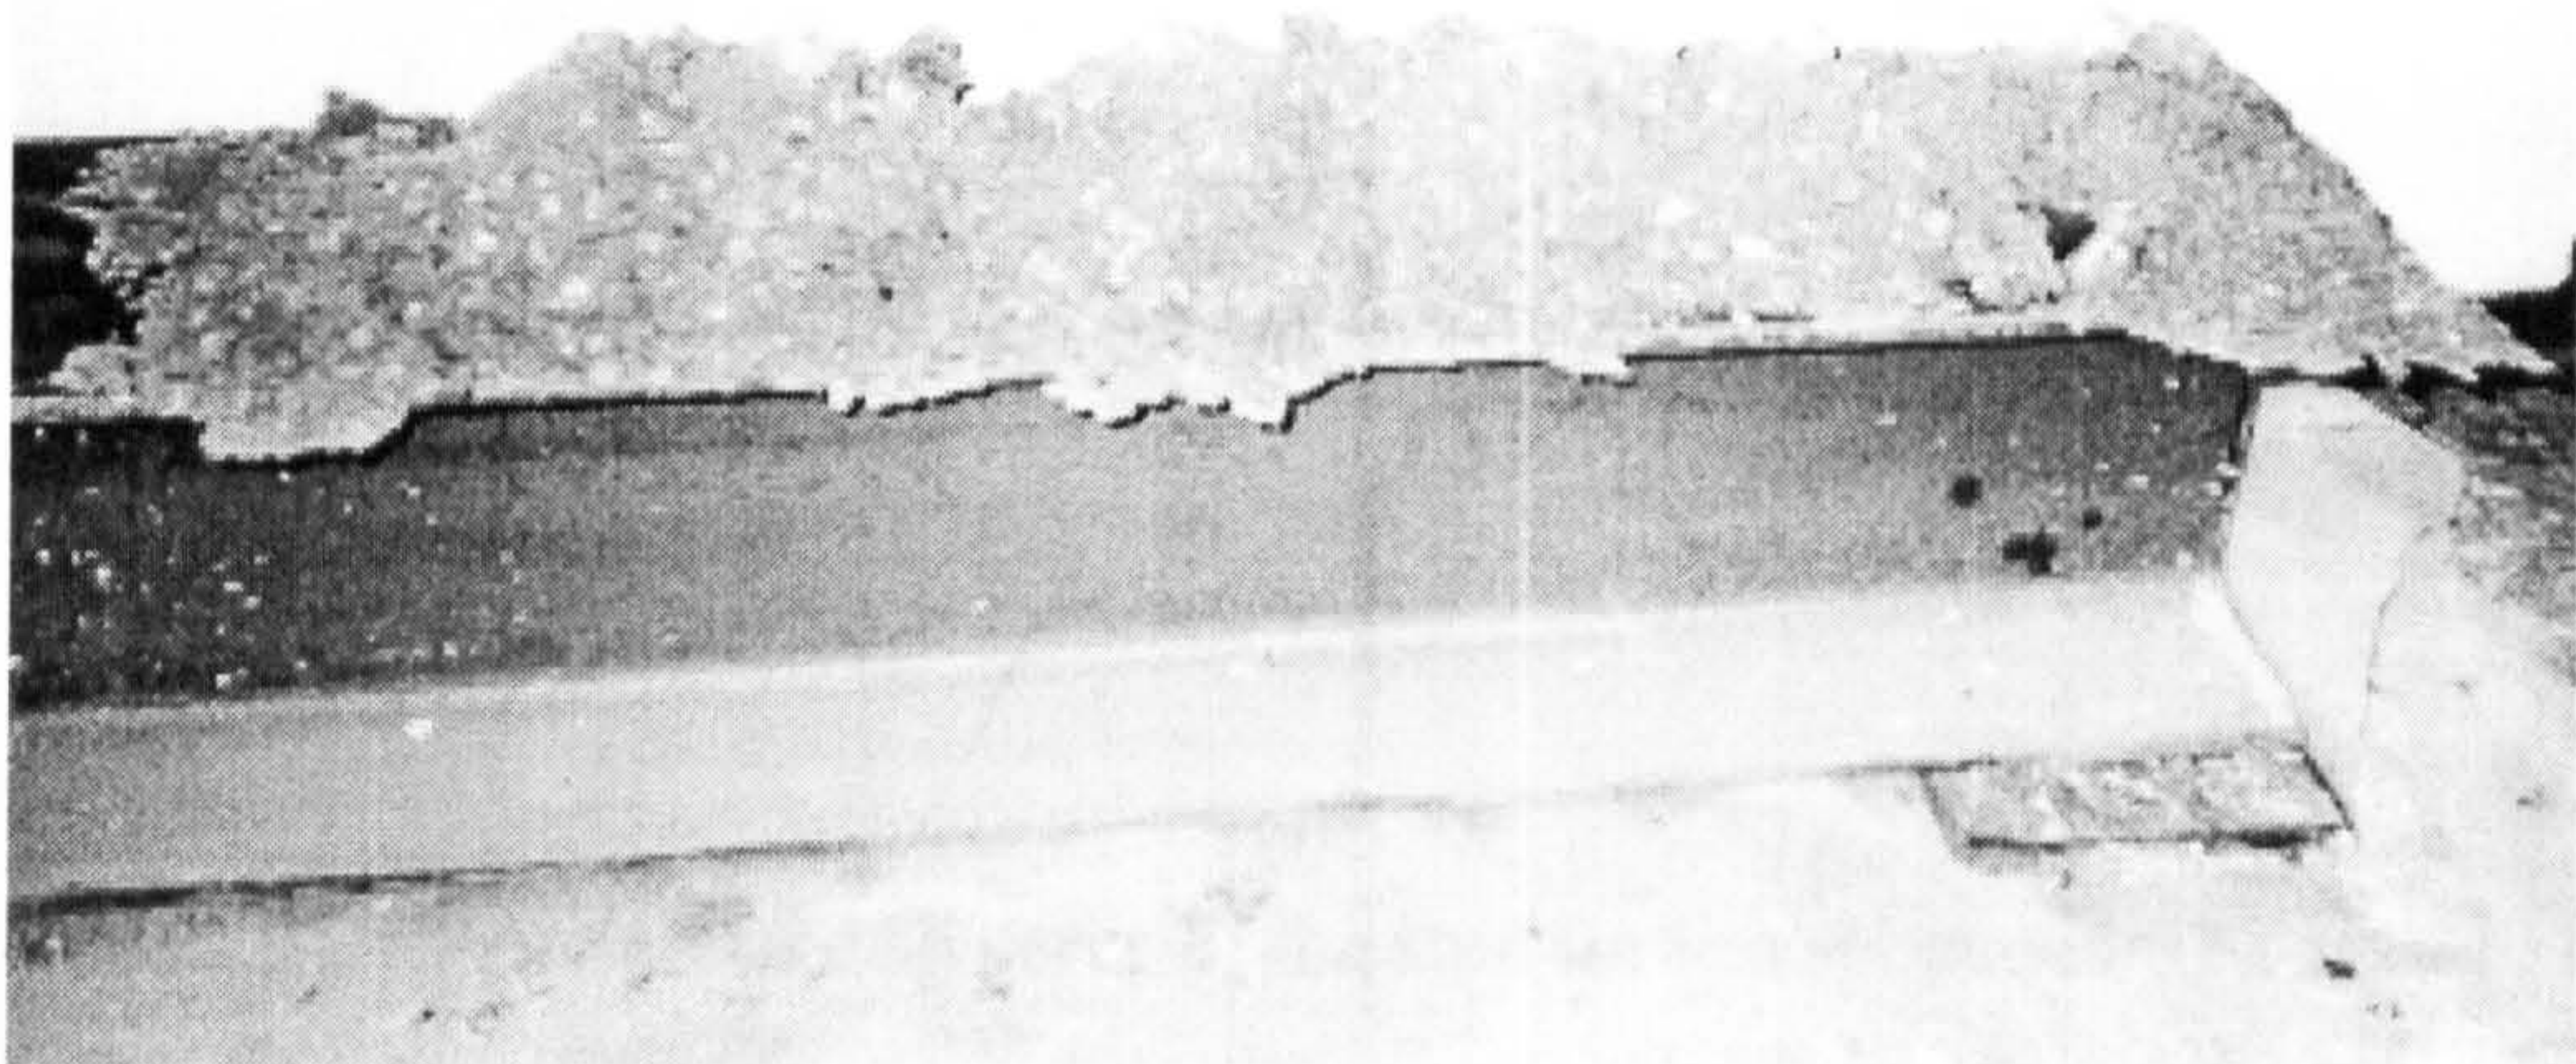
Conical failures of concrete around the studs for test specimen S2
